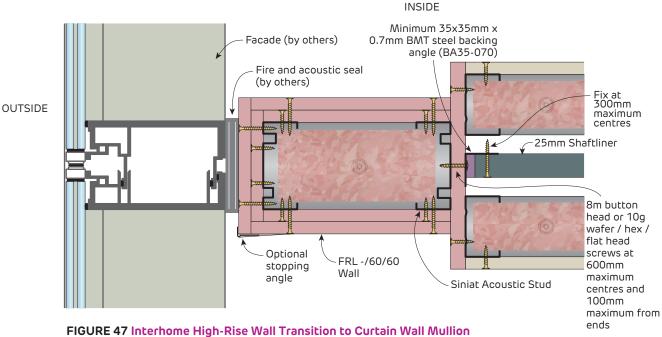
Interhome High-Rise Wall Transition to Curtain Wall Mullion Plan
